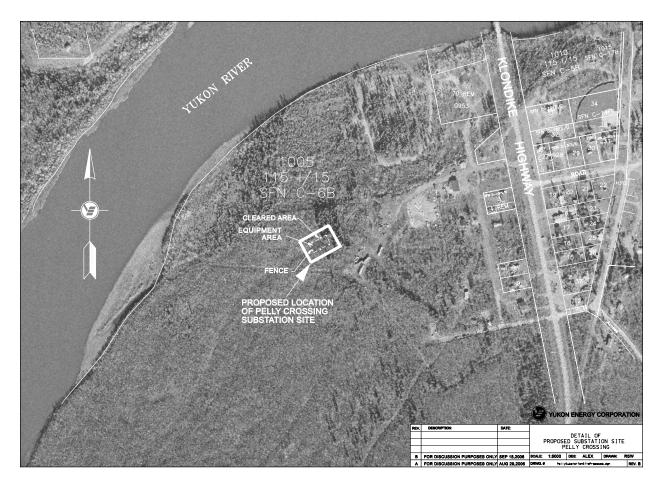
Footprint Conceptual Layout of the Pelly Crossing Substation
